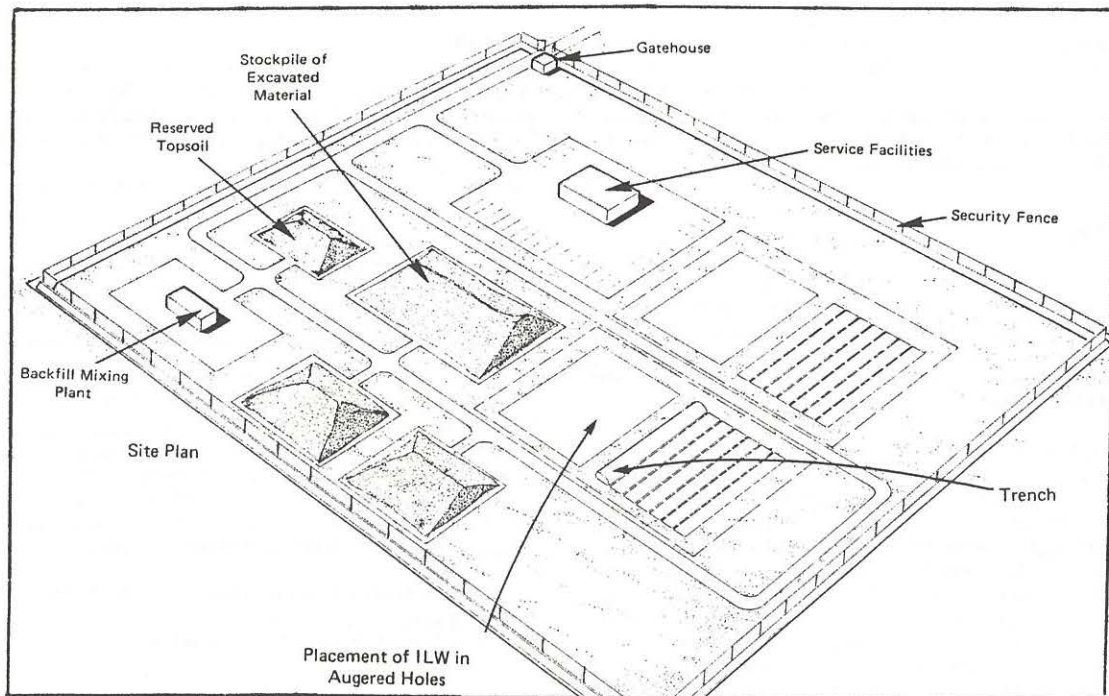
LAYOUT OF TRENCHES AND AUGERED BOREHOLES IN CLAY OR TILL
